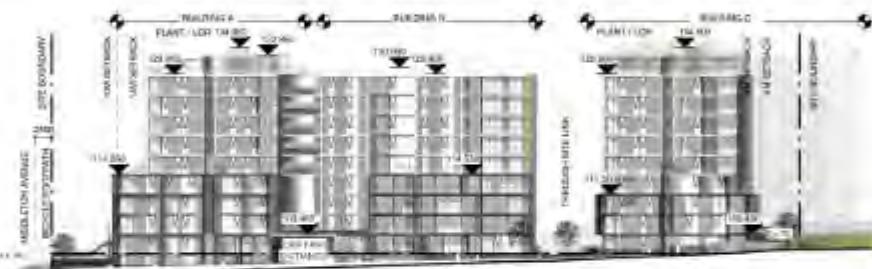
South Elevation – Dawes Avenue (Source: PTW Architects, 2019)
